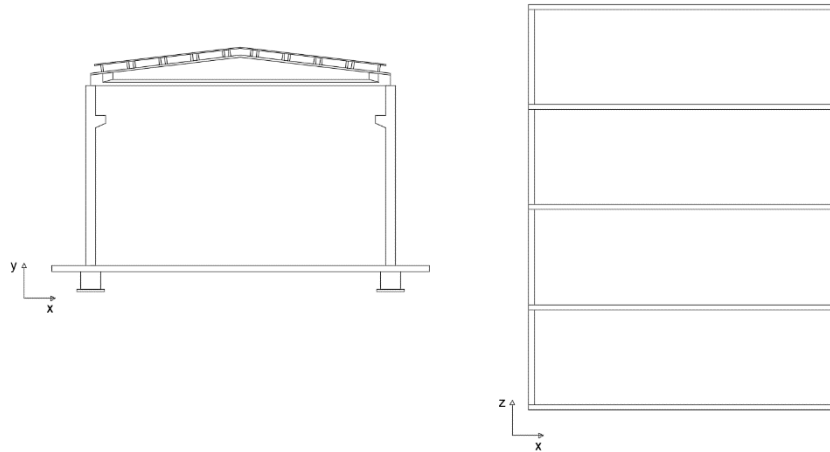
Front (left) and plan (right) views of the typical PRC buildings designed and modelled in the project.
